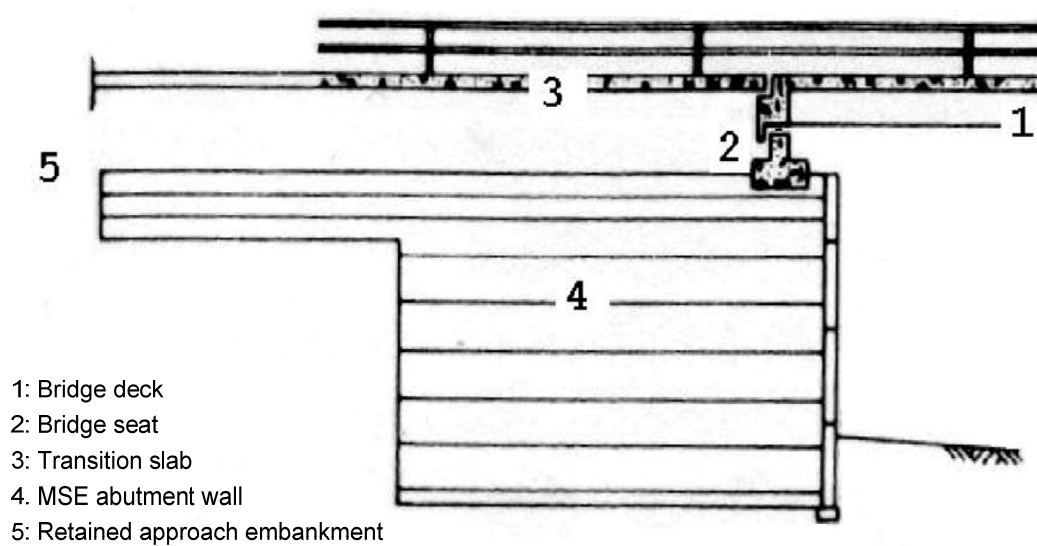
MSE abutment used as bridge support (from Jones, 1996)
